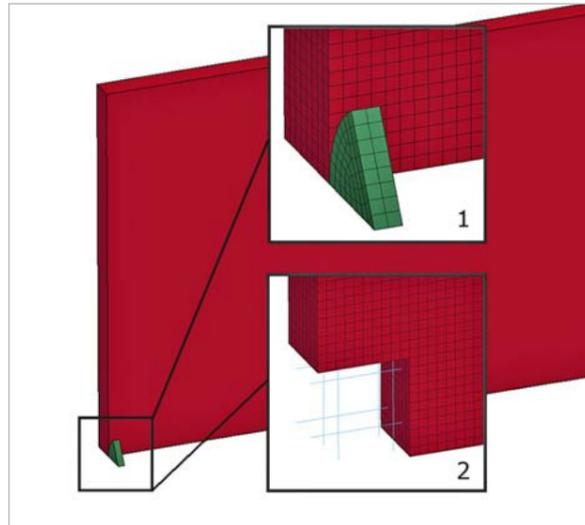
Double-symmetrical FE model of the burst protection wall; 1-fragment, 2-reinforcement
